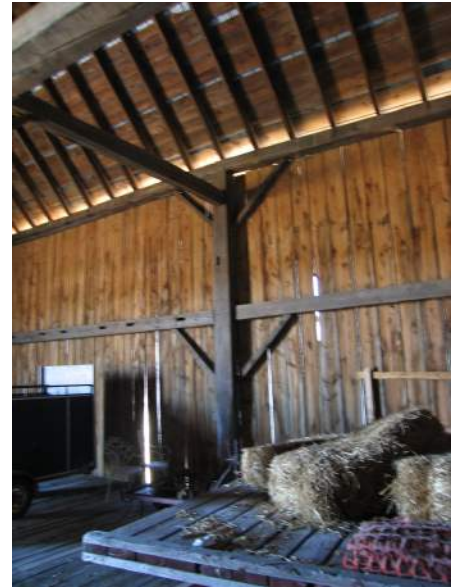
Conover Barn. Substituted Wall Girt. 2009.
